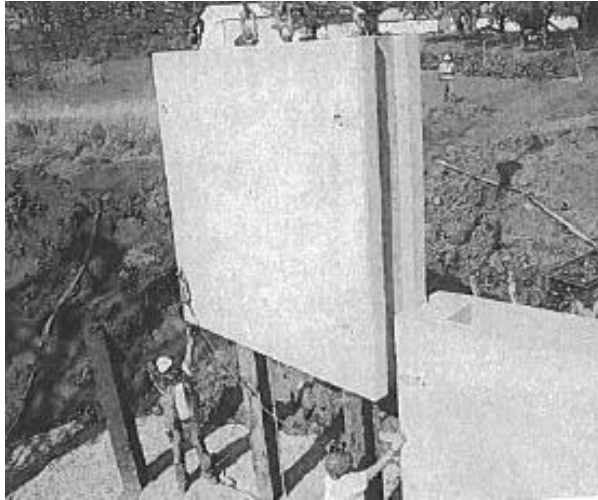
Precast abutment elements with cavities (eventually filled with cast in place concrete. Source: [4]
